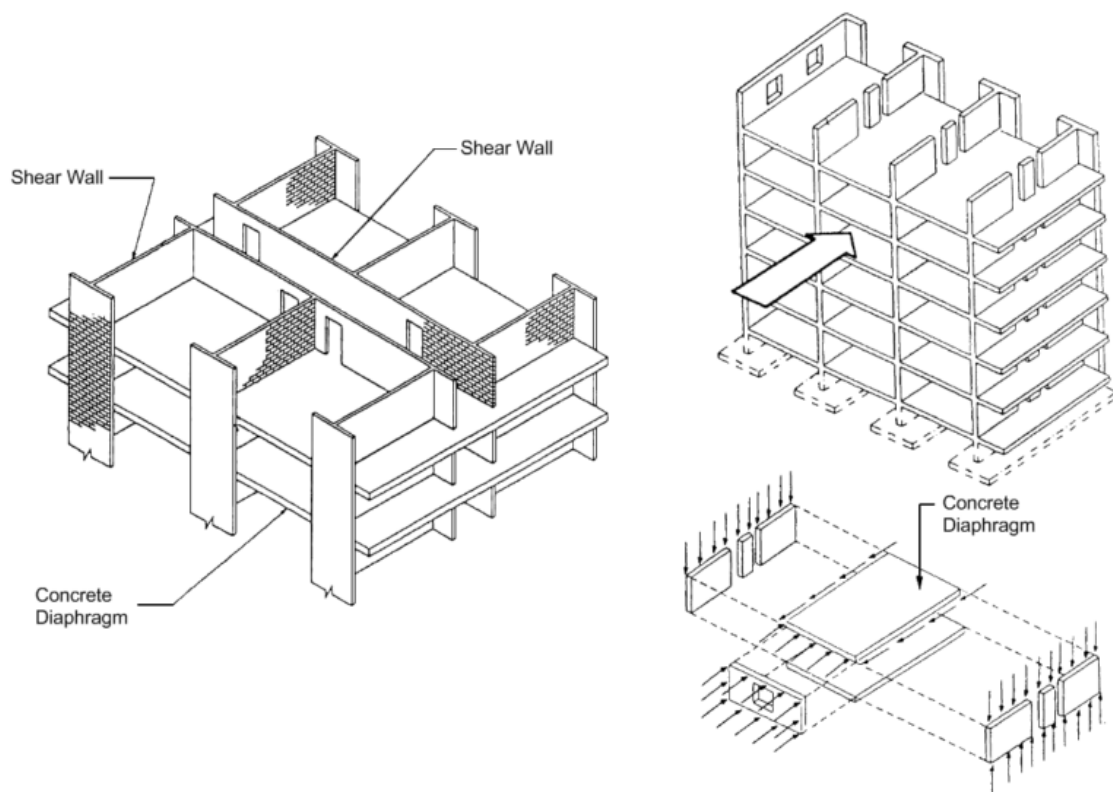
URM structural load path system (eg. Van Der Kolf, 2014).
